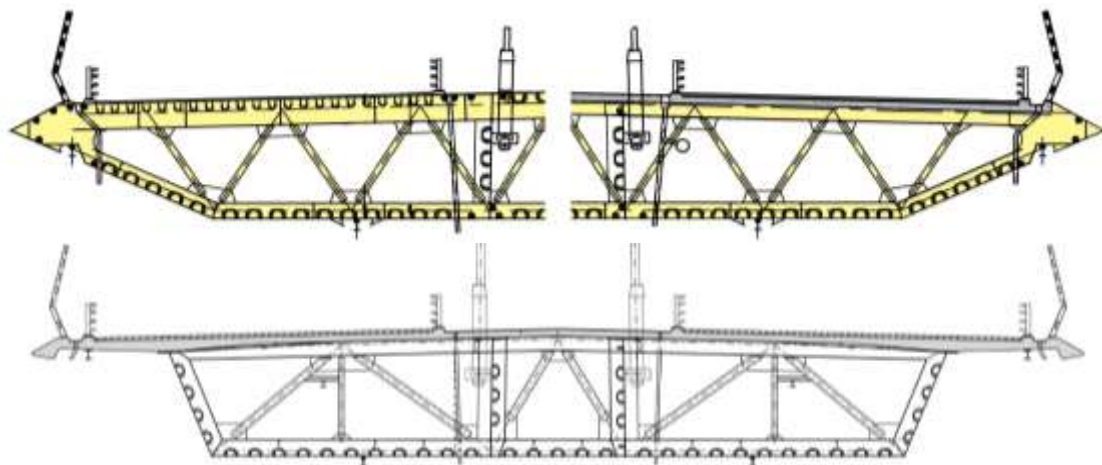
Cable-stayed bridge deck cross sections, specimen design (above) and adopted design (below).
